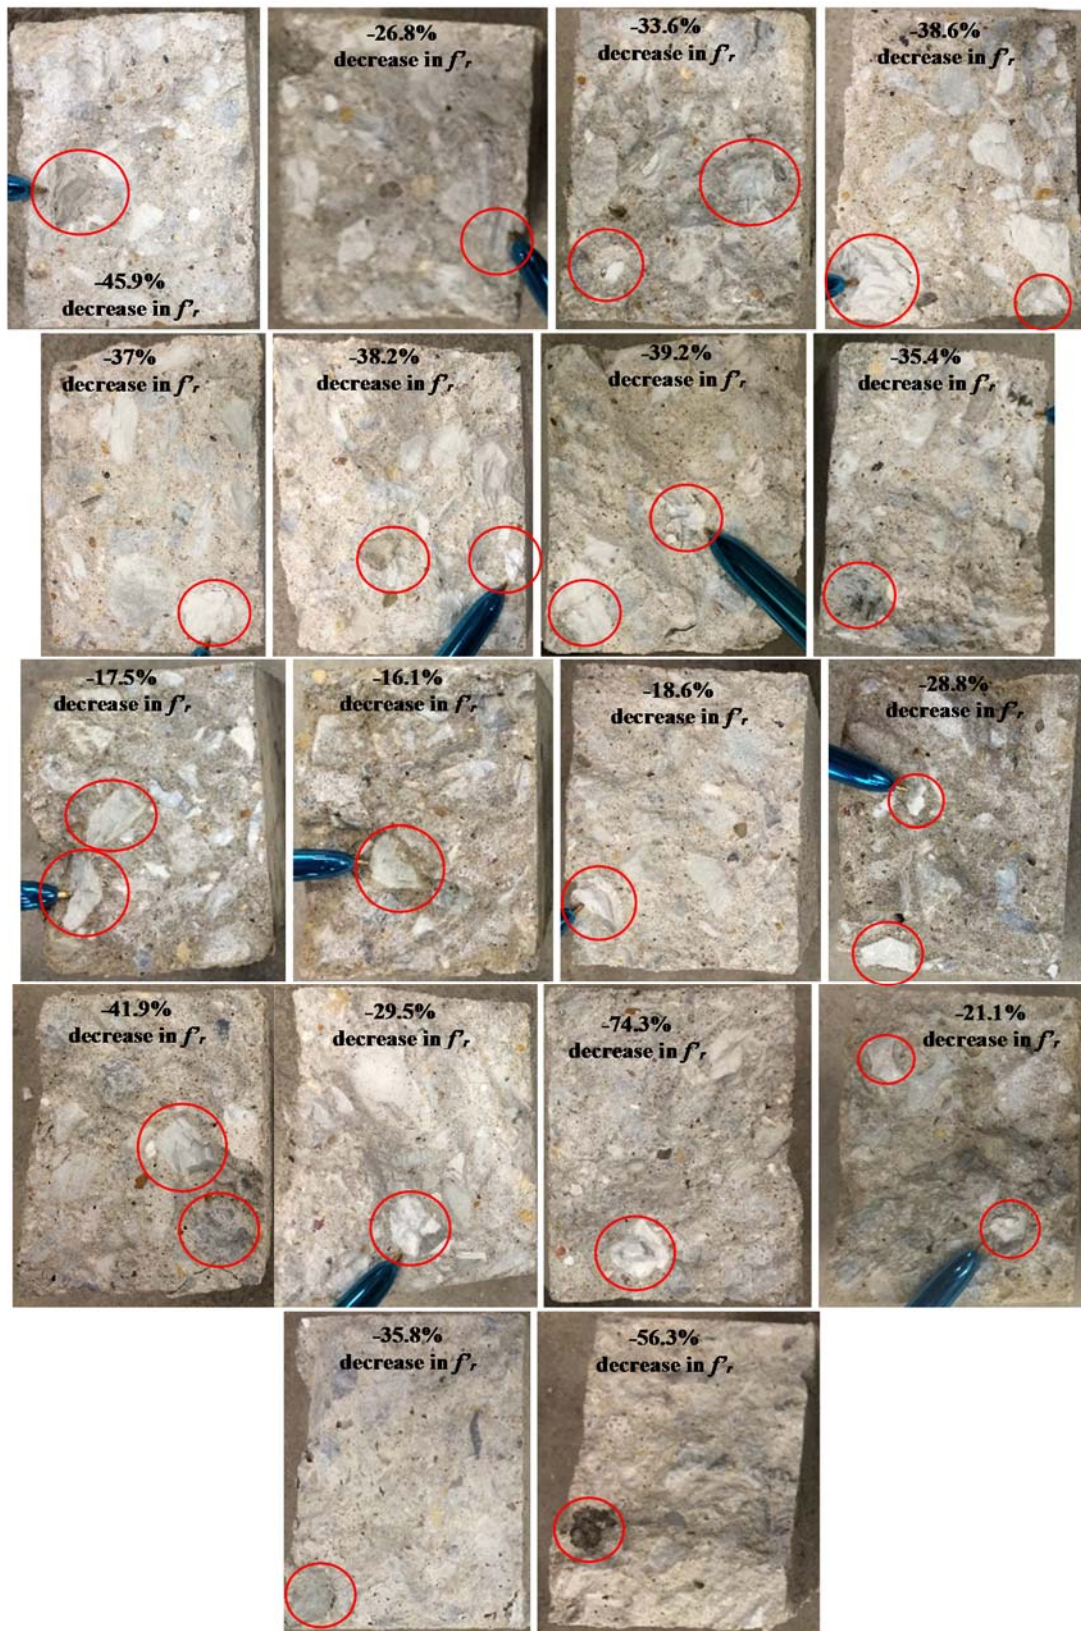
Inspection of the fractured surface after the flexure testing for freeze/thaw specimens with f'_r below the lower limit
